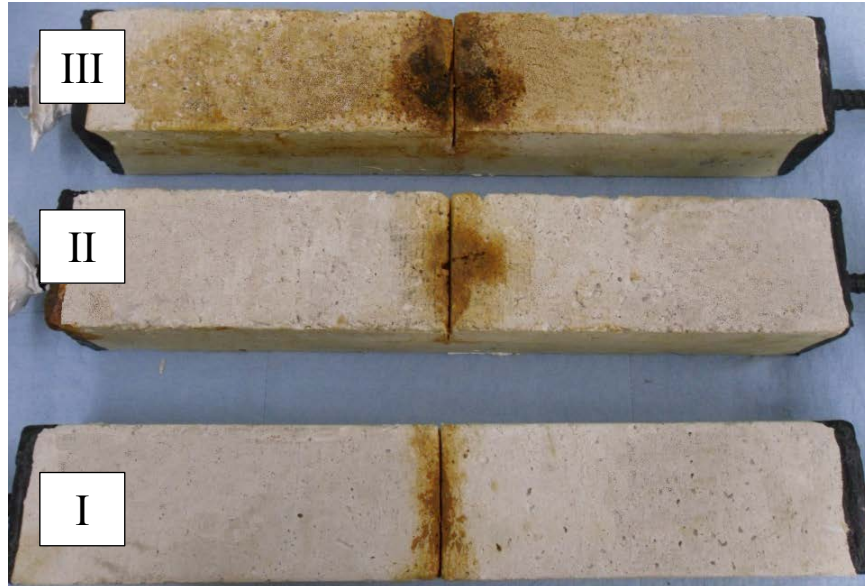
Specimens 0.8 mm - #2 after accelerated corrosion test
